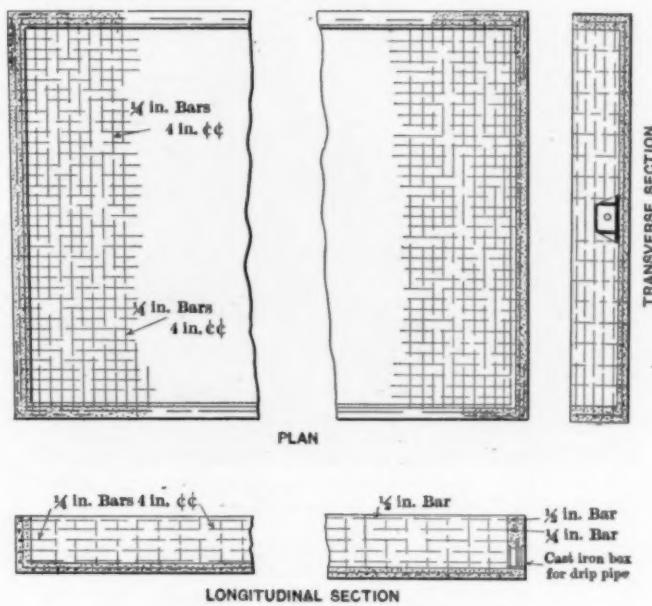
DETAILS OF GRAINER CONSTRUCTION
